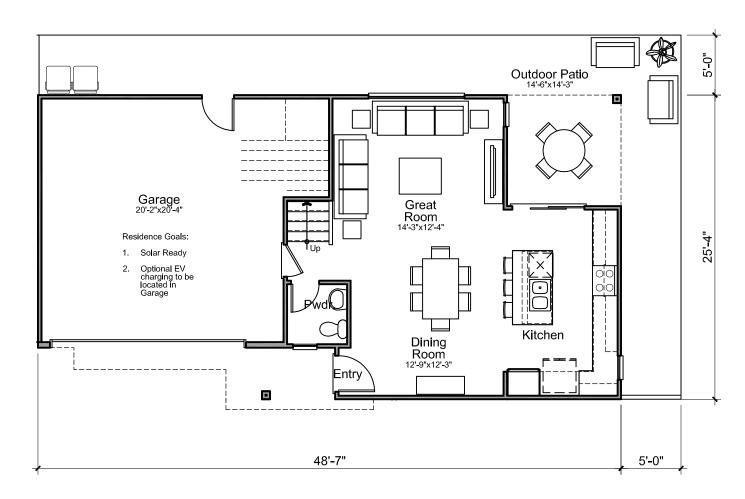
CONCEPTUAL FLOOR PLAN – PLAN 2
